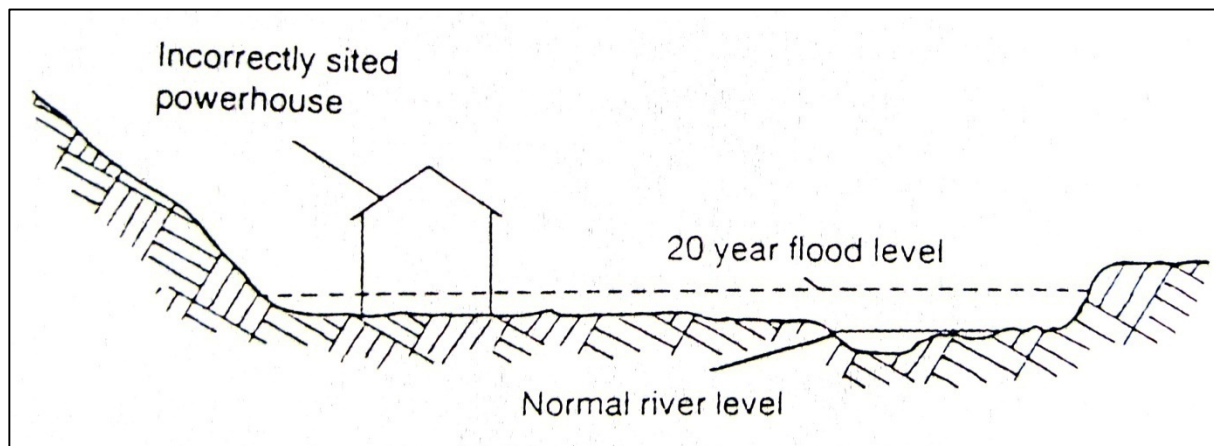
Always build the powerhouse above the 20-year flood level, which should be determined by speaking to local residents and searching for signs of flood debris (gravel, dry mud, flotsam, sand)
